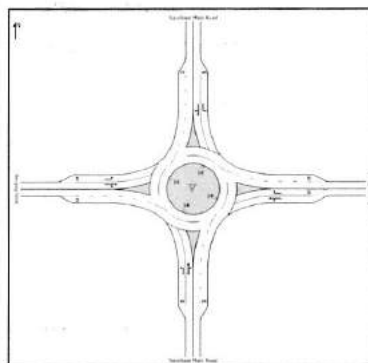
Extract of Diagram 2 showing improvements required at Sandbaai Main Road / Bergsig Street intersections
